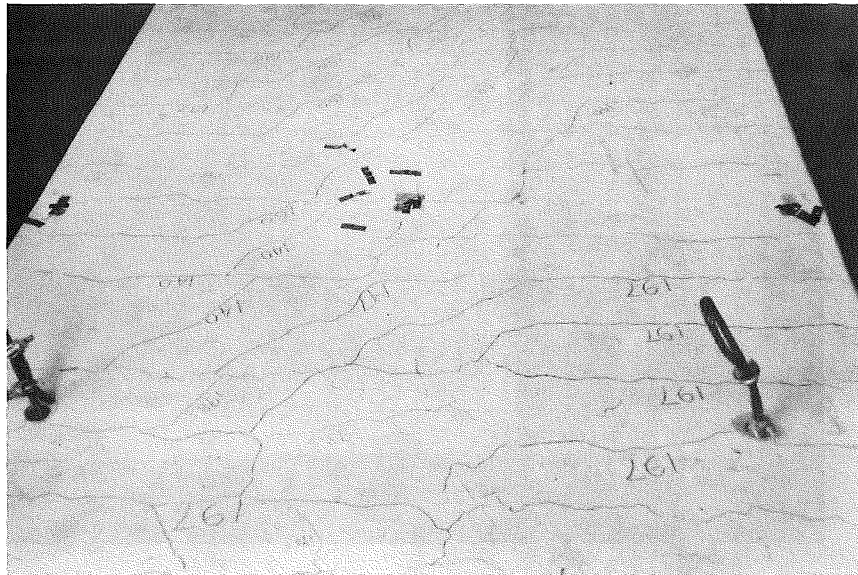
Cracks on Concrete Deck Surface over Panel 8,
